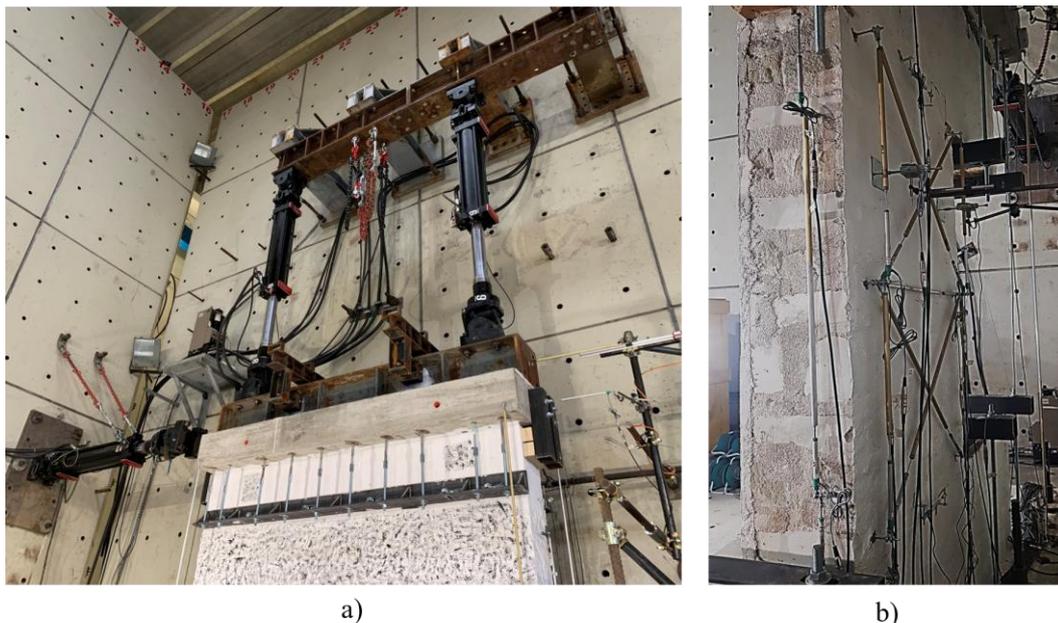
a) Test setup, and b) instrumentation on a slender pier.
